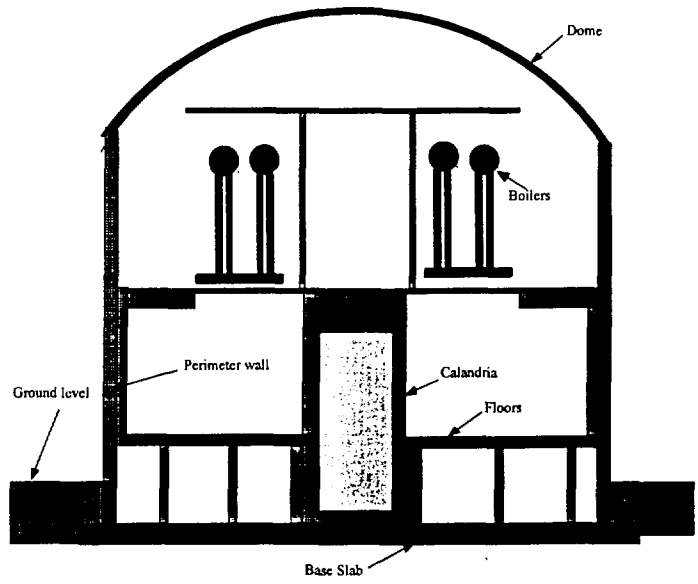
A typical CANDU 6 Generating Station, Reactor Building, General Elevation
